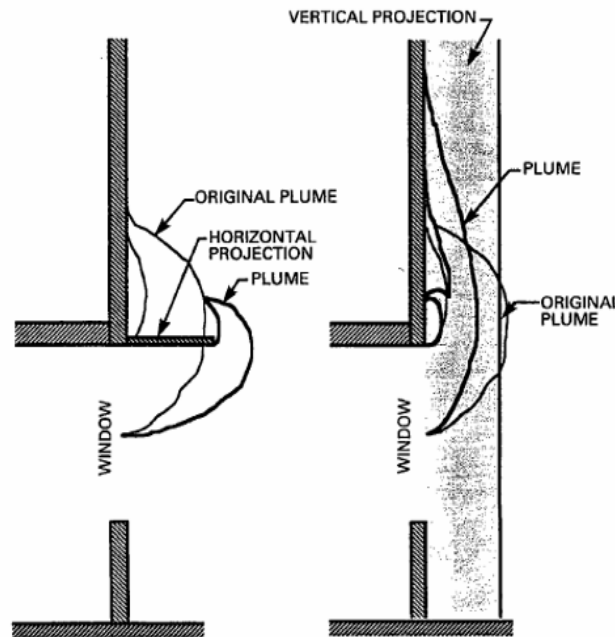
Impact of horizontal and vertical projections on window plume.¹⁰⁰
